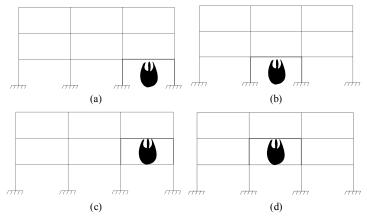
Accepted scenarios of calculated fire: (a) - lower floor - outside span, (b) - lower floor - middle span, (c) - middle floor - outside span, (d) - middle floor - middle span
